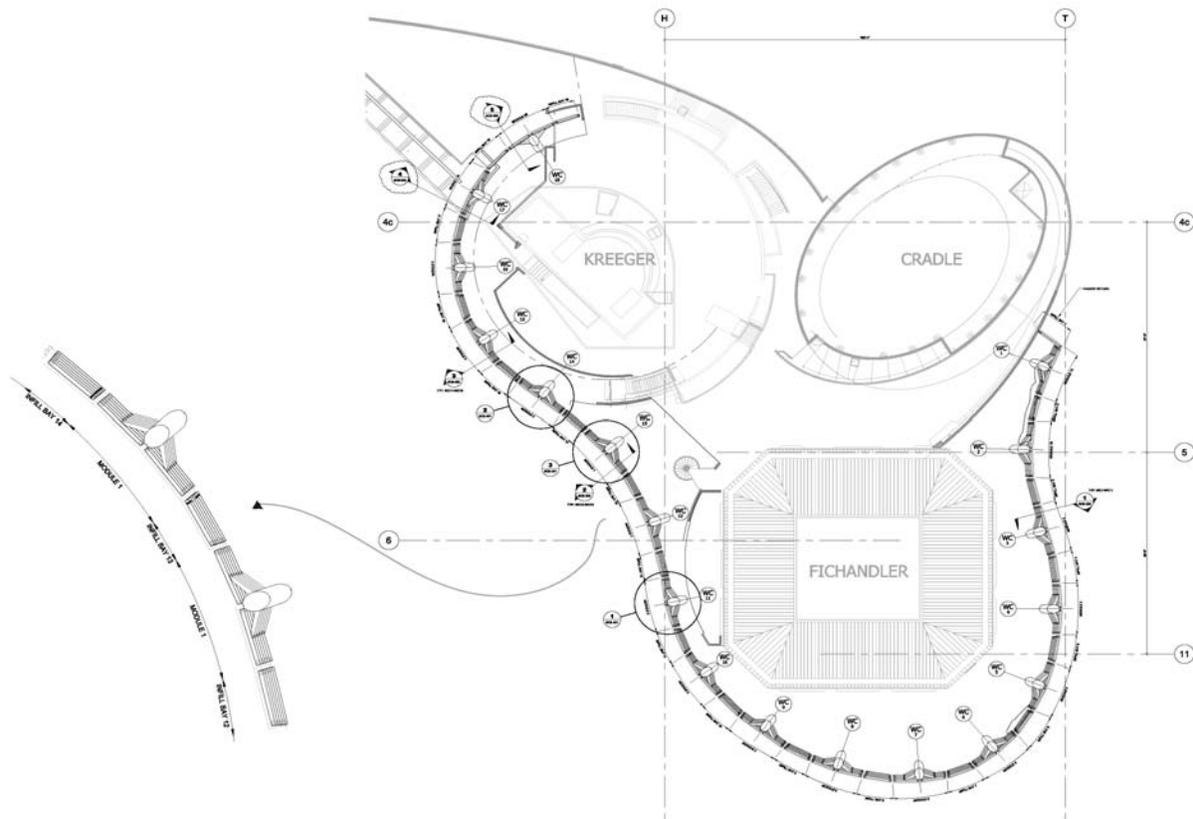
Timber PSL column-muntin façade layout (note close-up on left).
